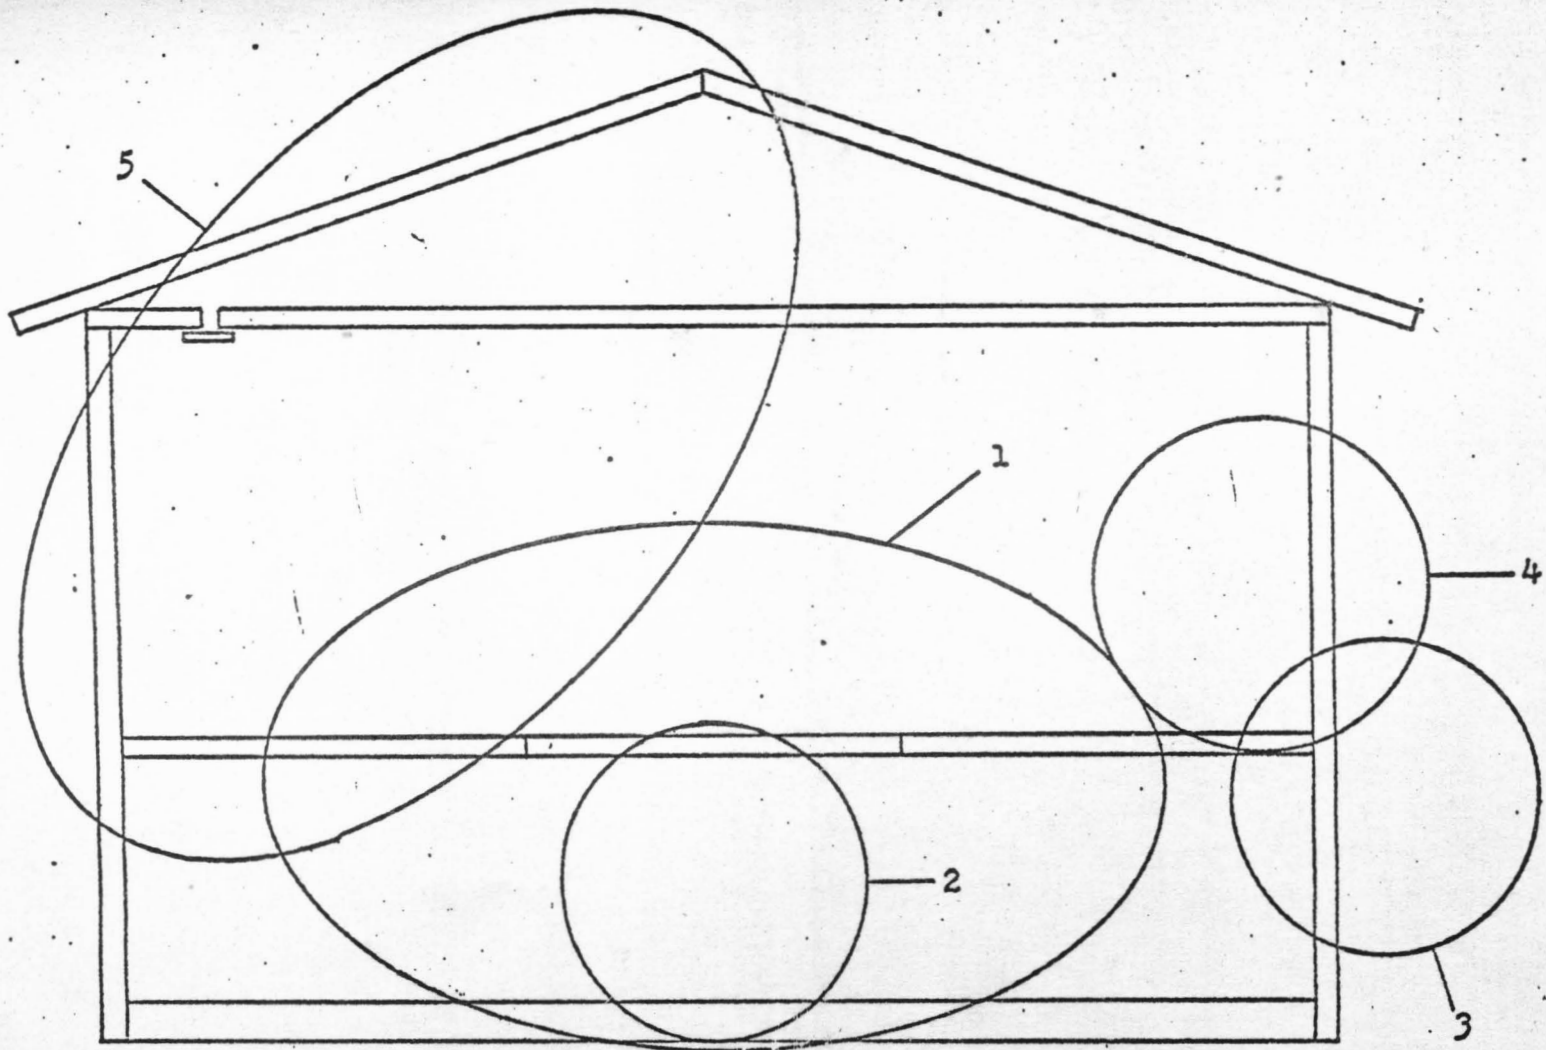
Location of detail sections of the manure pit ventilation systems. (Note figures 6, 7, 8, 9, and 10.)
